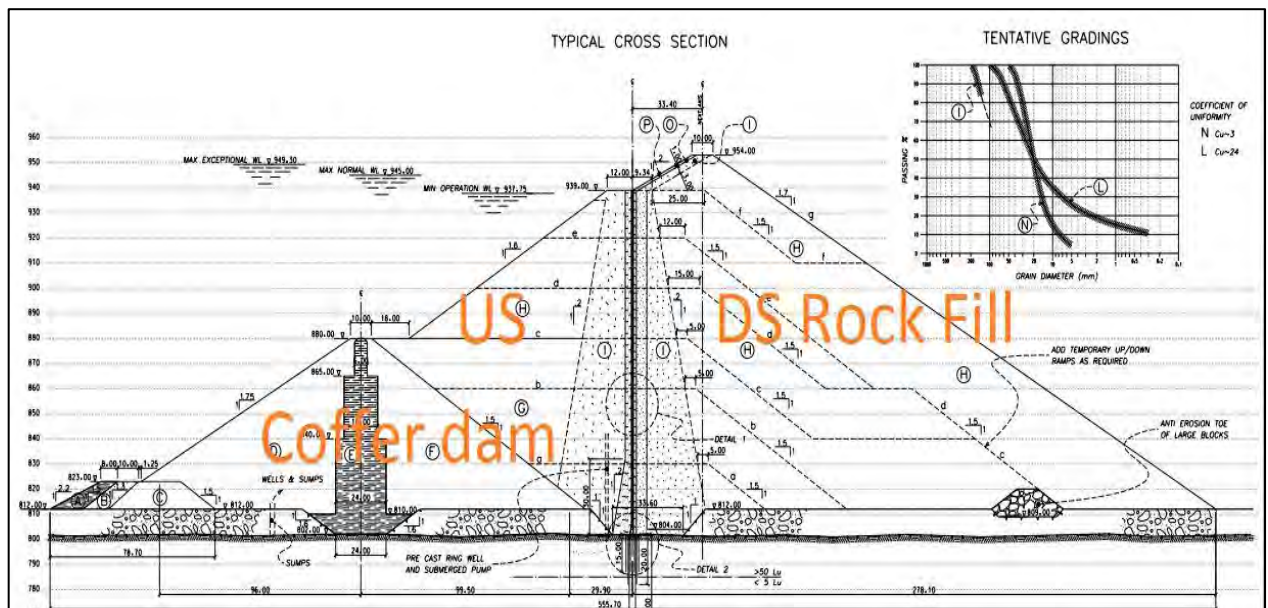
Zarima Dam Cross Section (Source SGI and SC, 2014)
